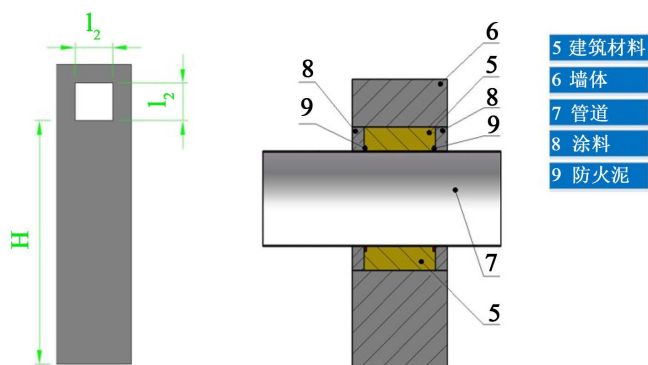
Schematic diagram of the method for installing pipes on the wall of the joint workshop
